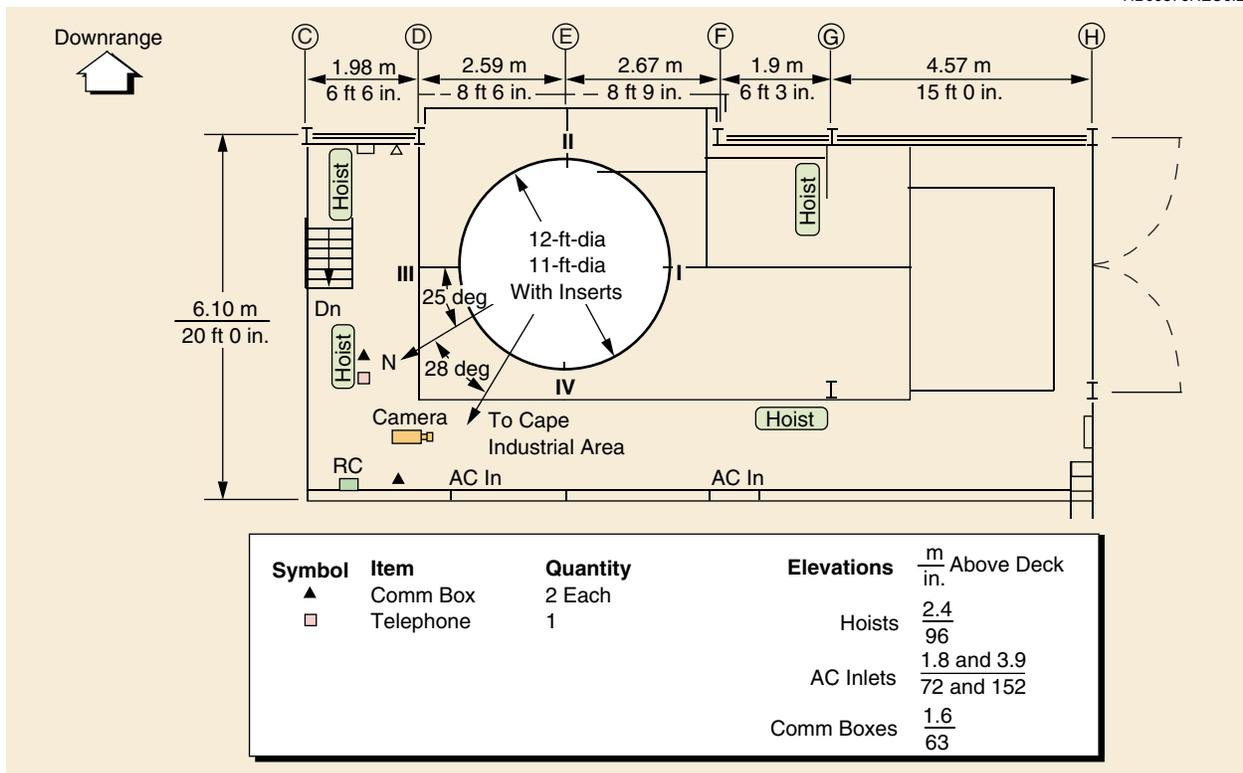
A. Level 9C Floor Plan, Pad 17A
